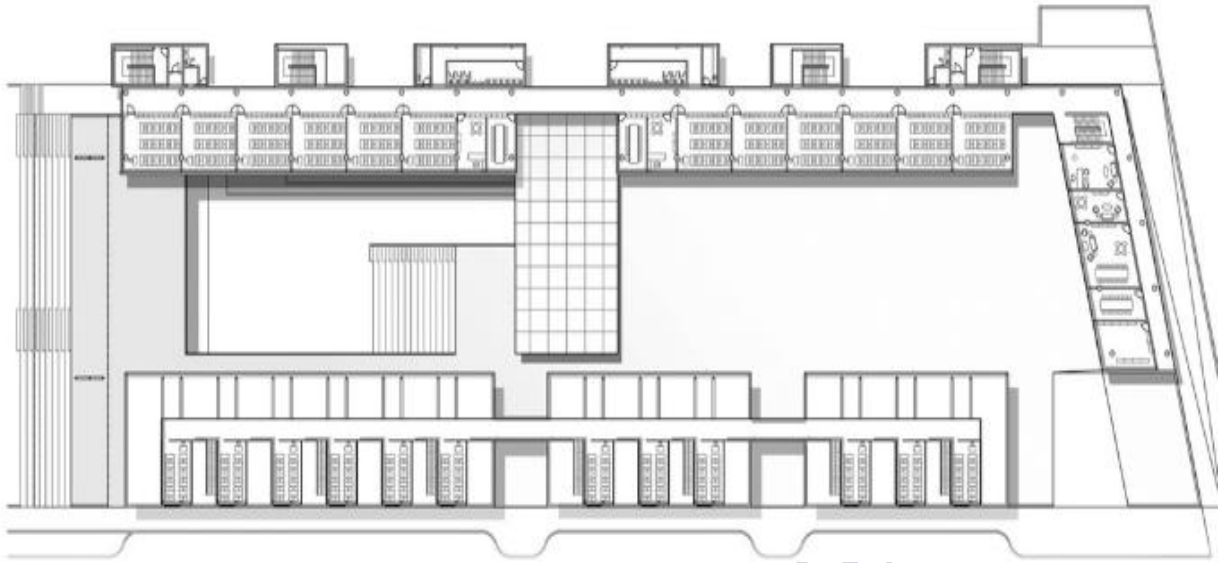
Second Floor Plan. Source: archdaily.com (2022)
